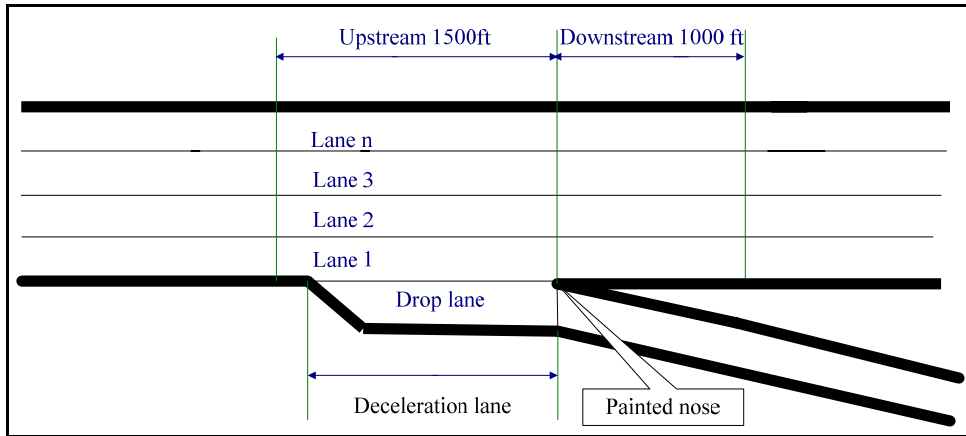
Type 1 Exit Ramp Length: Parallel from a Tangent Single-lane Exit Ramp
